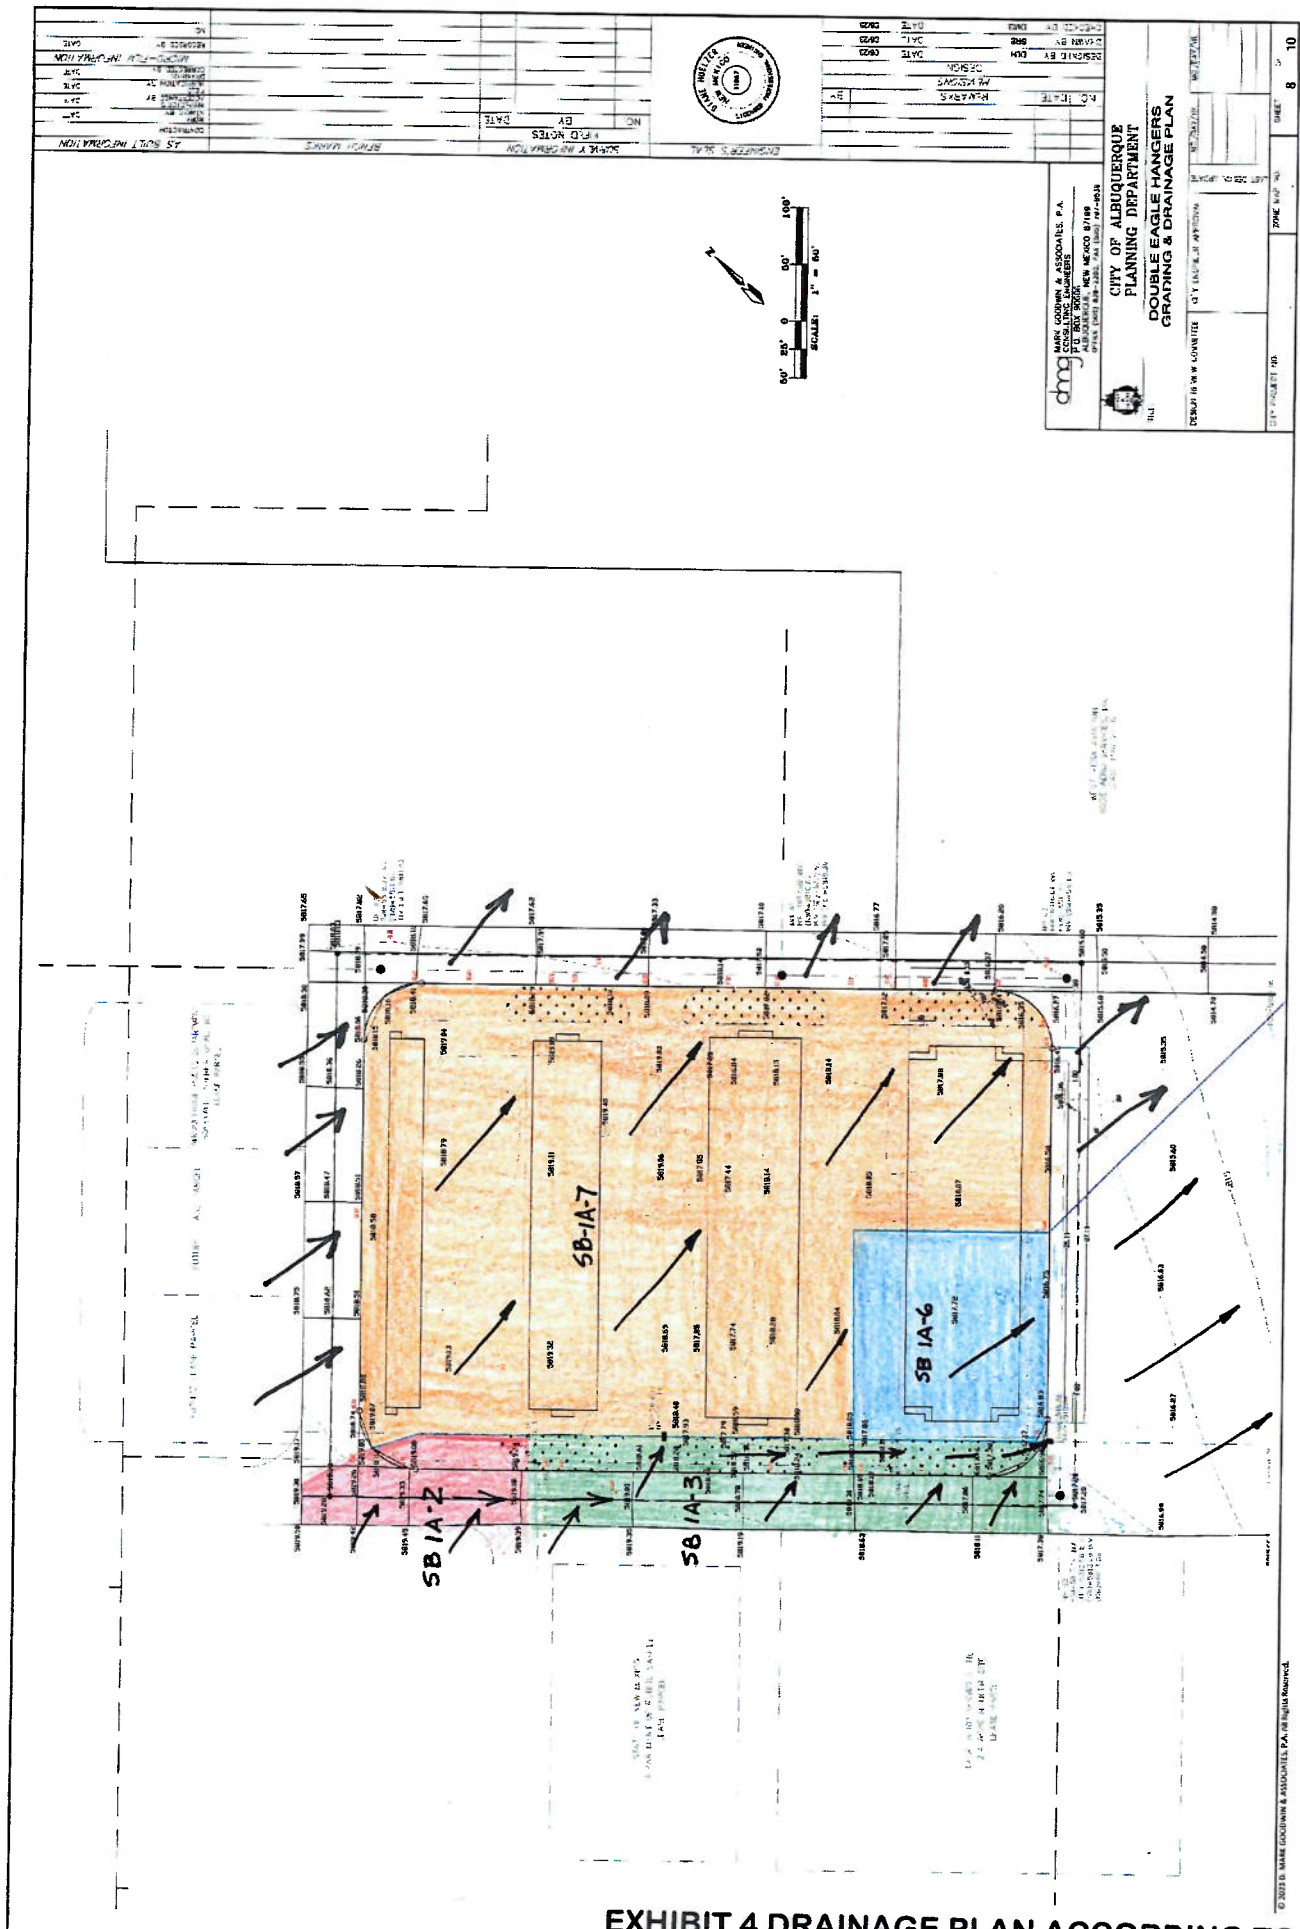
DRAINAGE PLAN ACCORDING TO C-103
